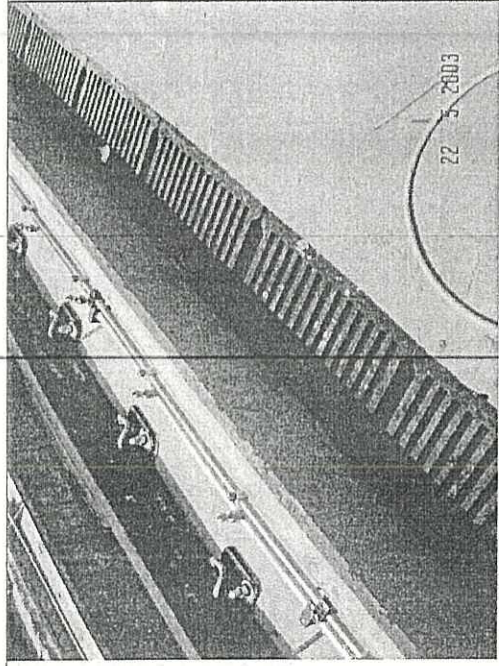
Surface drainage for trackside run-off at Car Wash Facilities.
